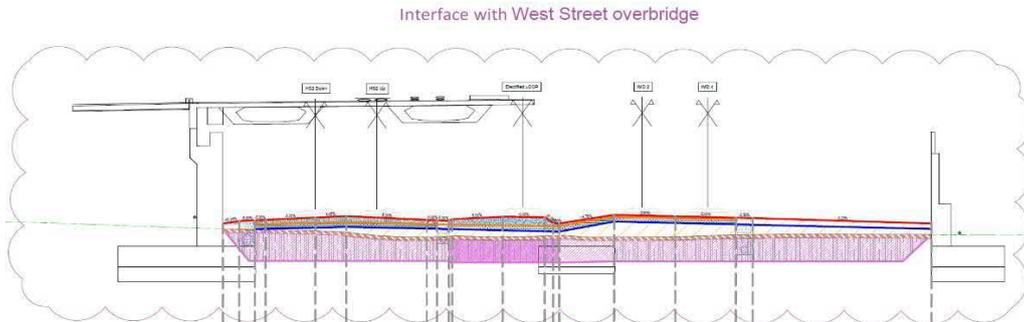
Cross Section of Twyford Embankment at Ch.HS2 81+186
